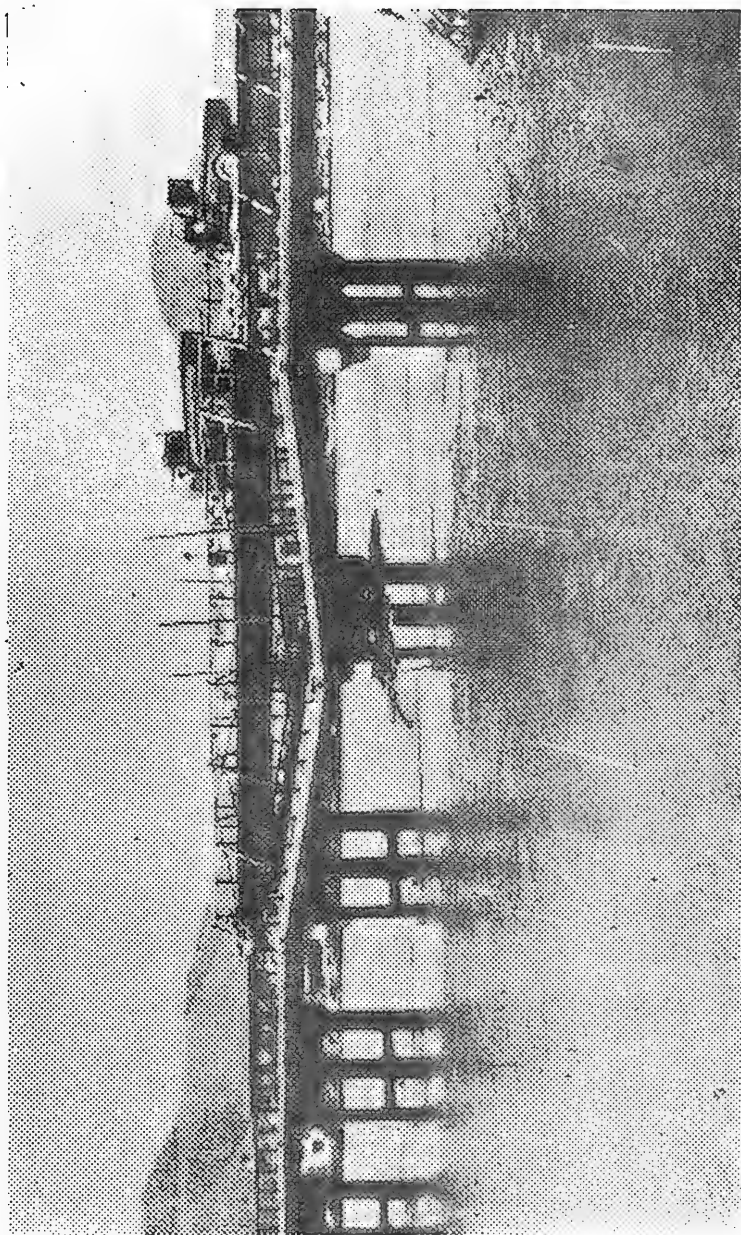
Bridge damaged by 1960 tsunami at Mangoku, Japan (from Iwasaki and Horikawa, 1960).
